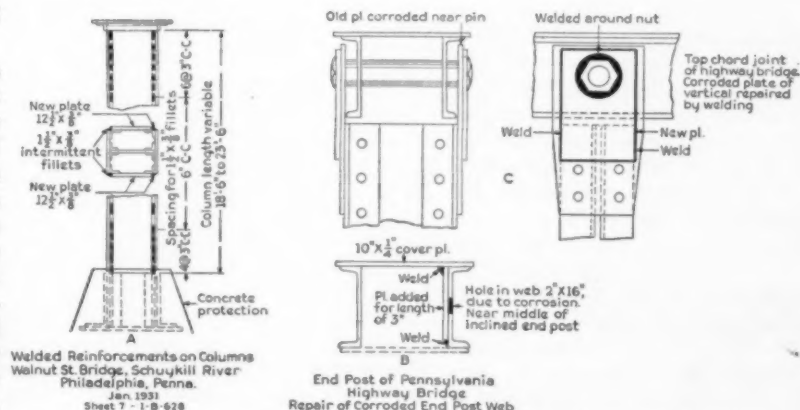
Reinforcing the Channel Web of a Truss End-Post Where Corrosion Had Formed a 2 x 16-inch Hole in the Web
